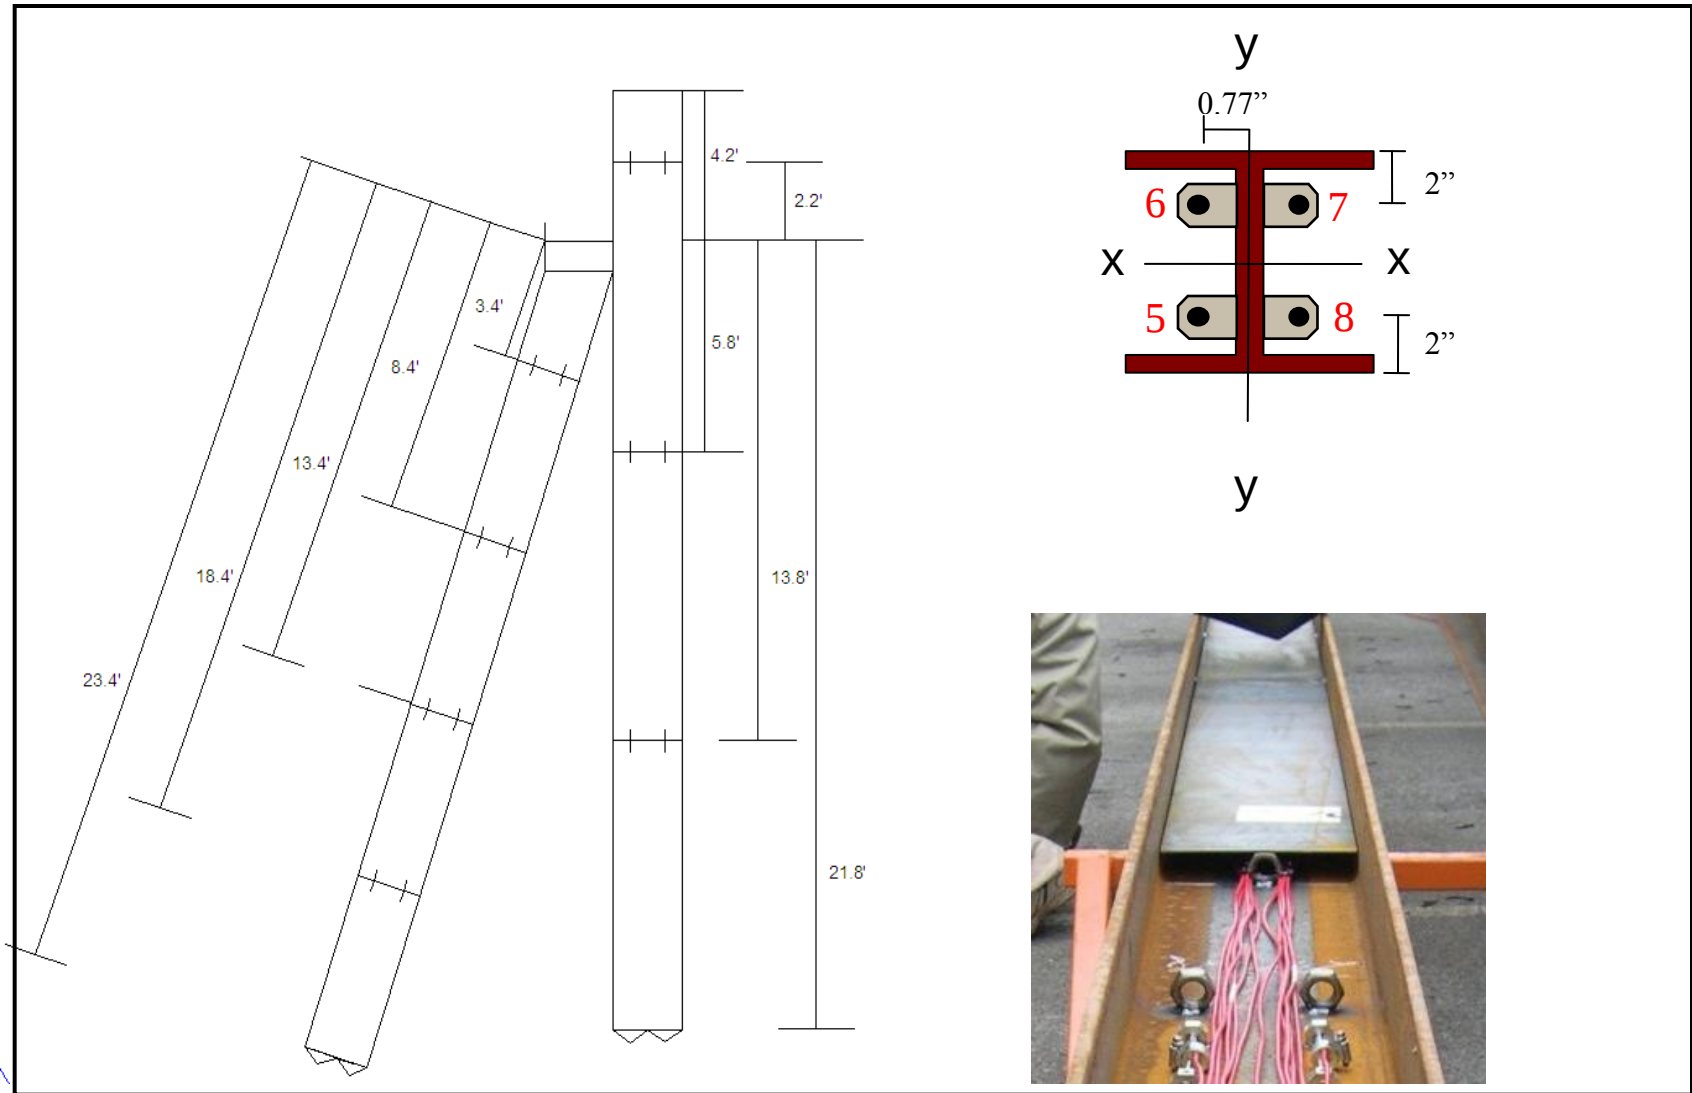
Strain Gage Layout of Section 1 W, with typical gage layout
